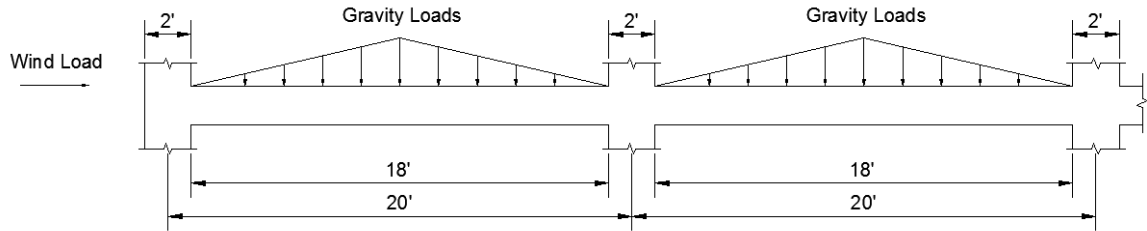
Typical exterior and interior beam span of the exterior frame on the first floor including the design loads
